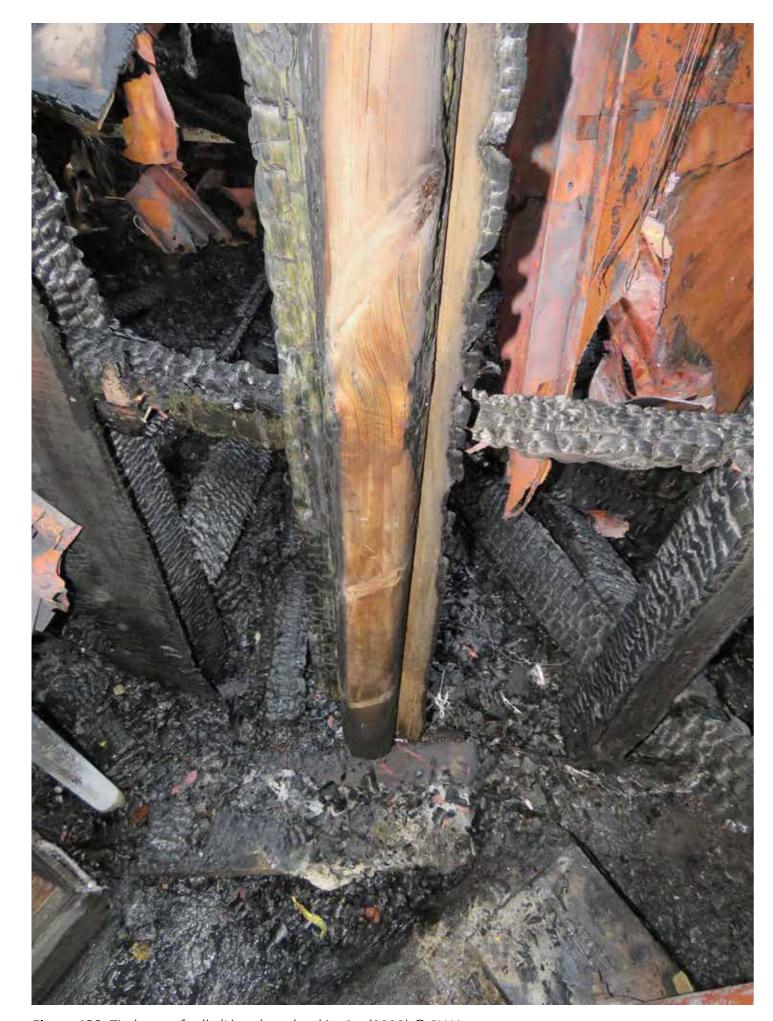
Timber roof rolls (L) at base level in situ (2020) © SLHA
